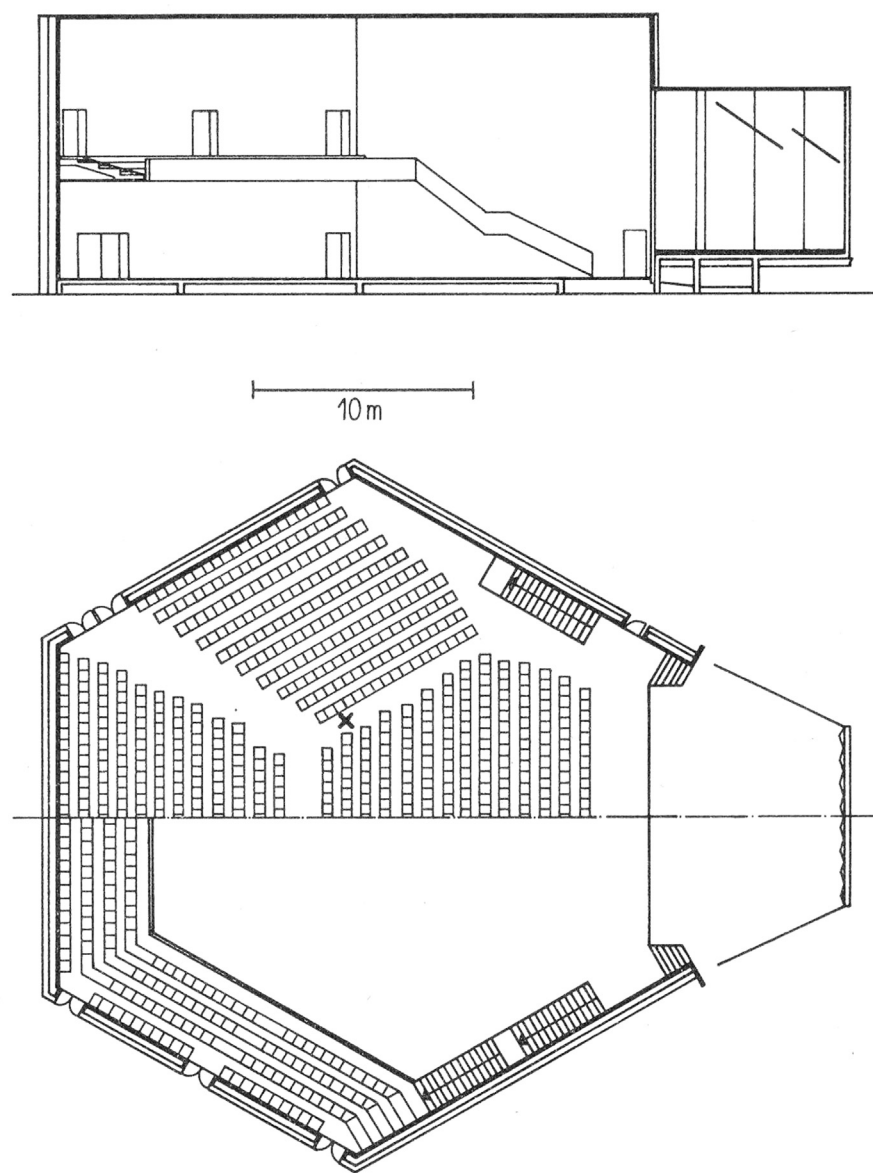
Long section and plan of the Göttingen Stadthalle [6].
